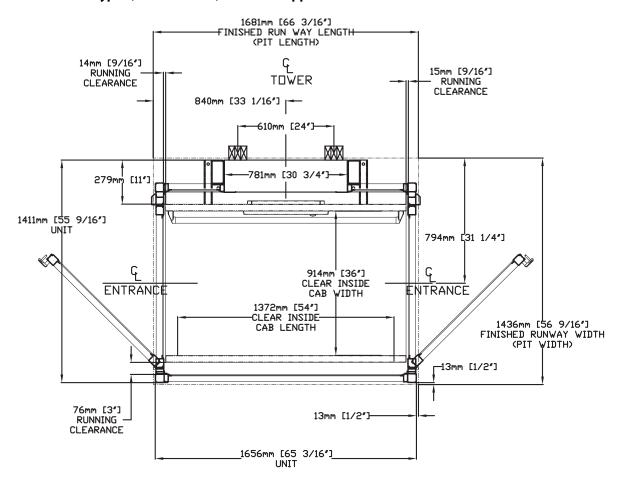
Plan View - Type 3, 36" x 48" Cab, Hoistway Application
